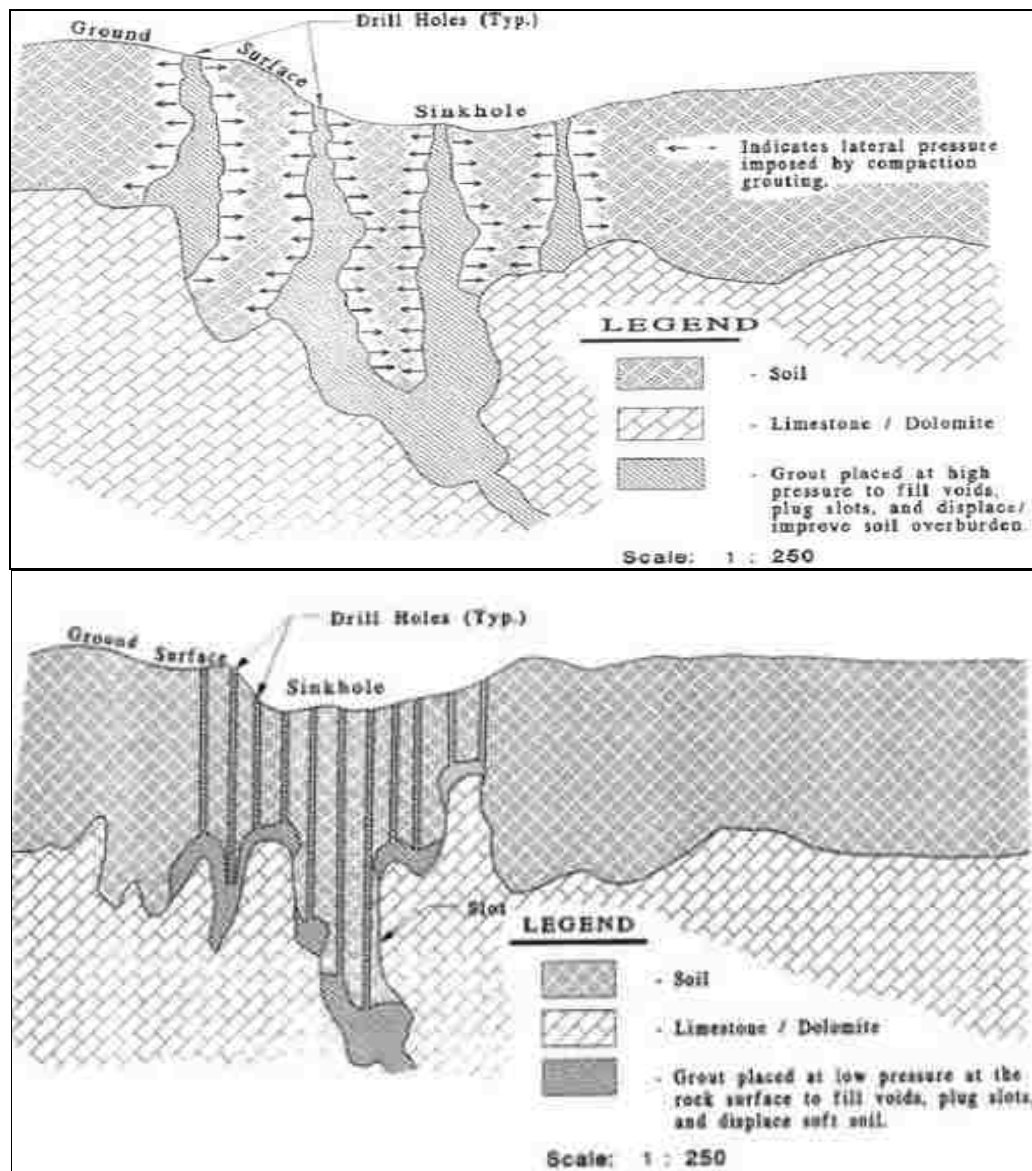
Sinkhole Grouting; Top: Compaction Grouting; Bottom: Cap Grouting
